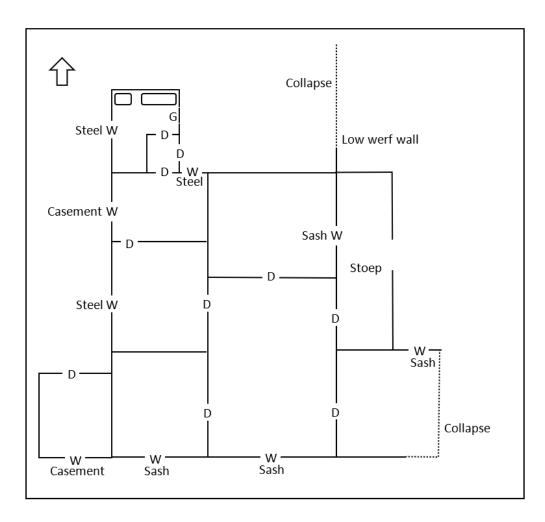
Floor plan of the house at waypoint 301. D = door, W = window, G = gas geyser.
